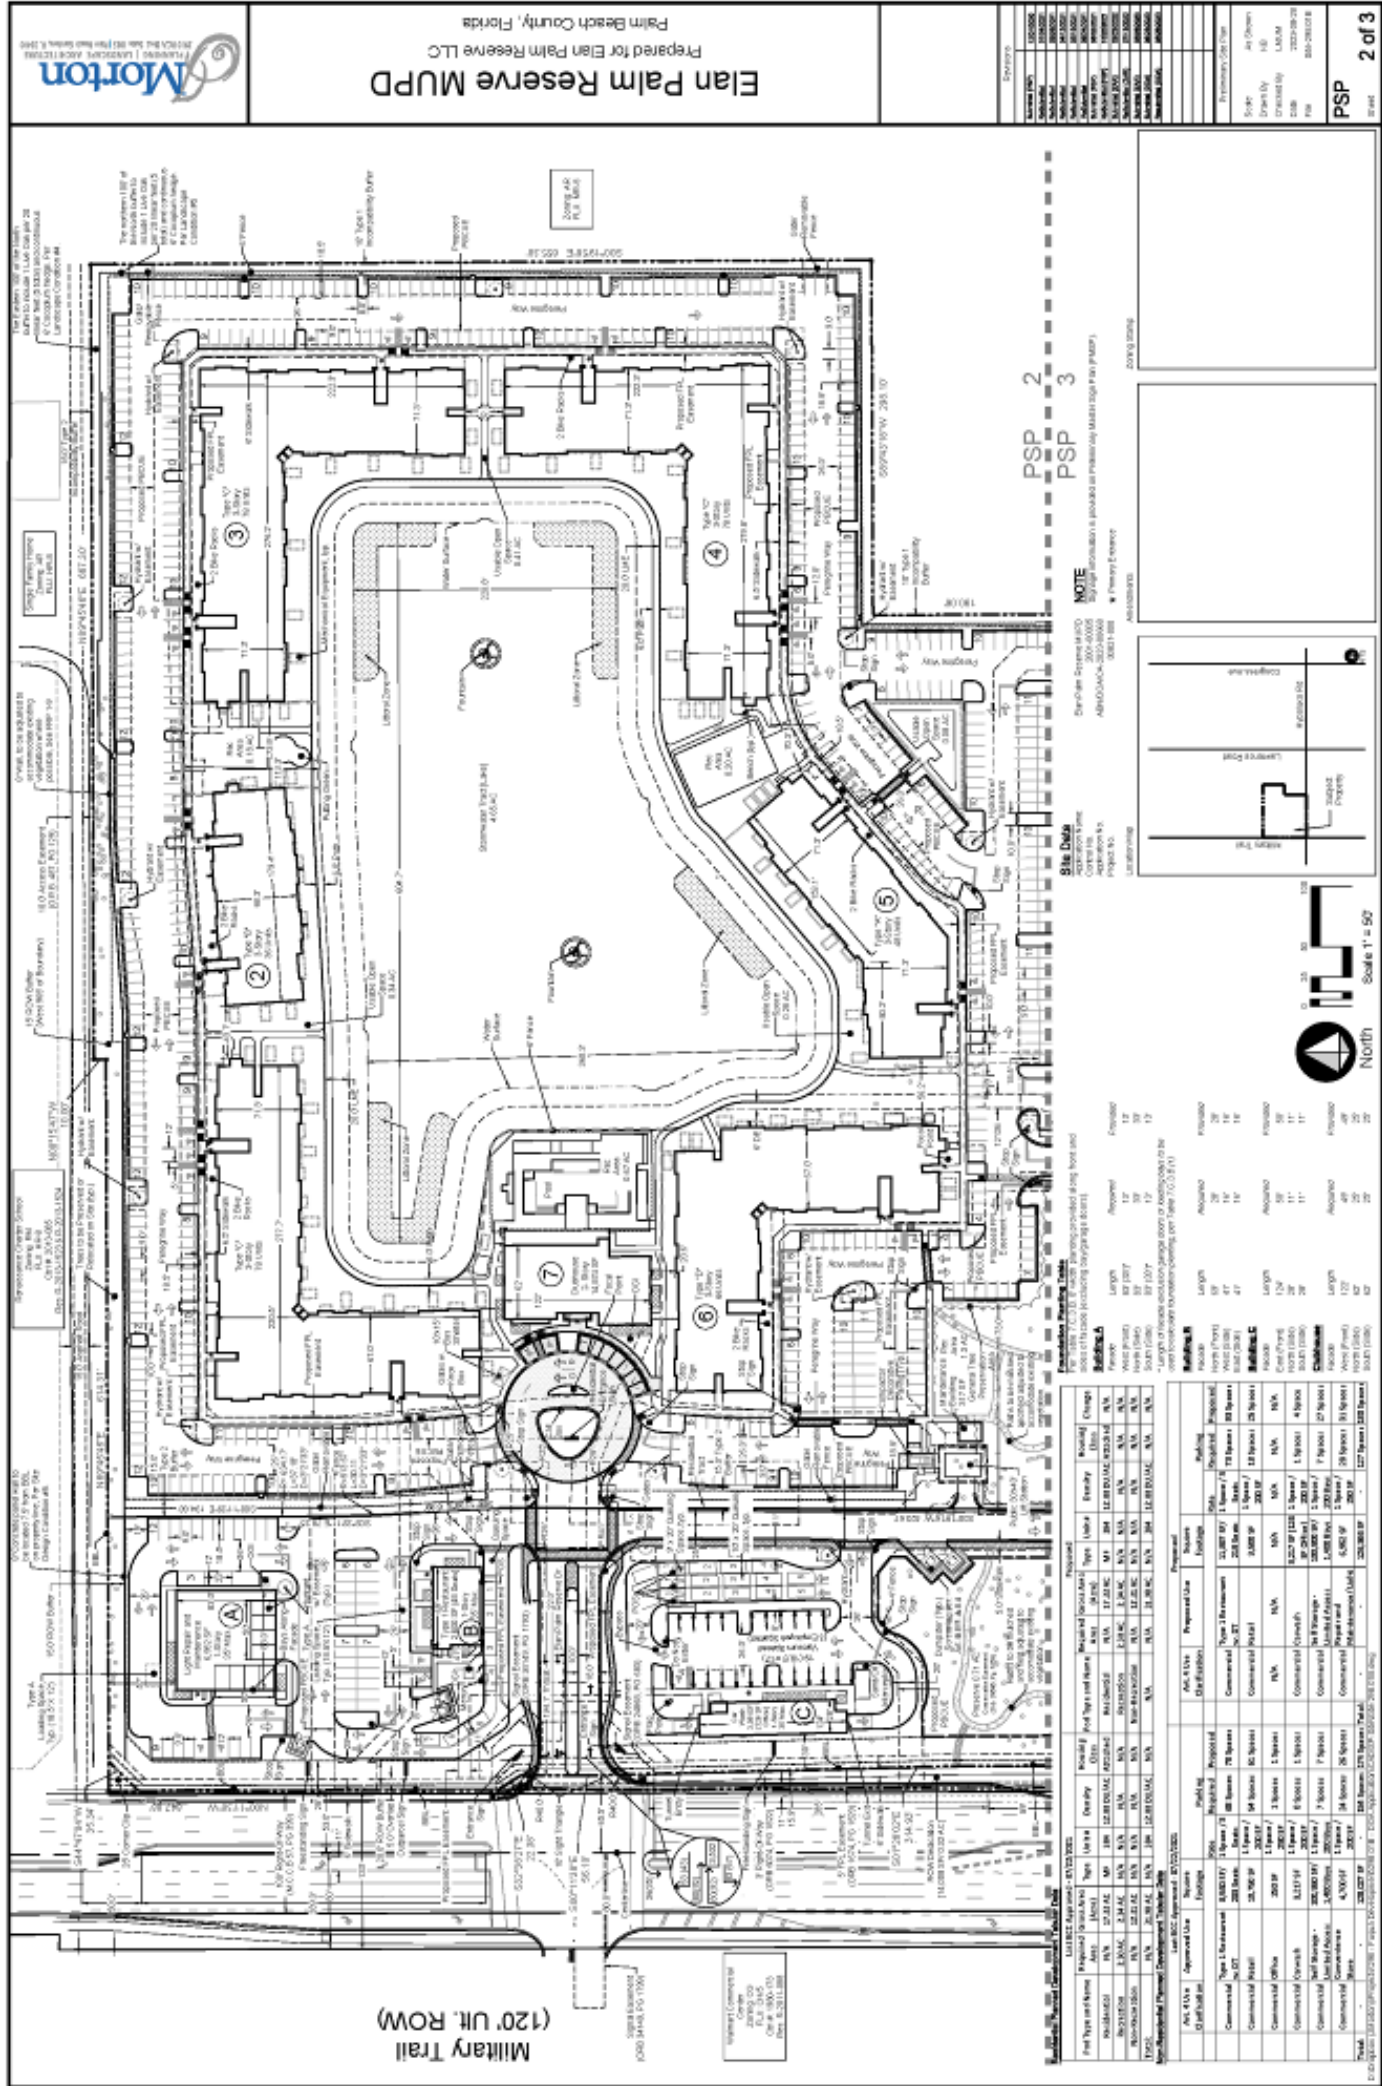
Preliminary Site Plan dated September 13, 2023 (page 3 of 3)
